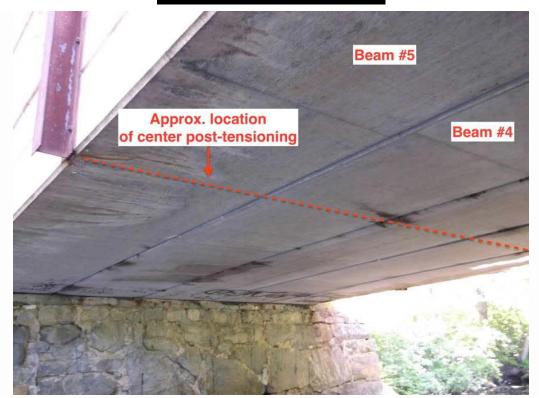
Underside of beams looking Southeast, typical moisture stains.
